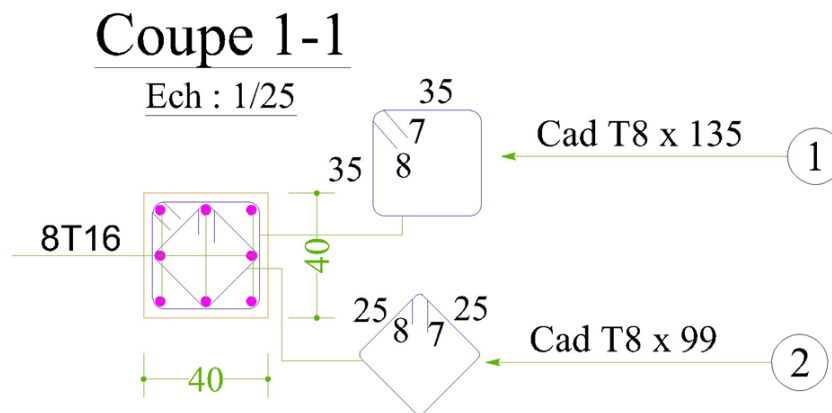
Cross-Section Of a Reinforced Concrete Column (Personal work (based on design codes))
